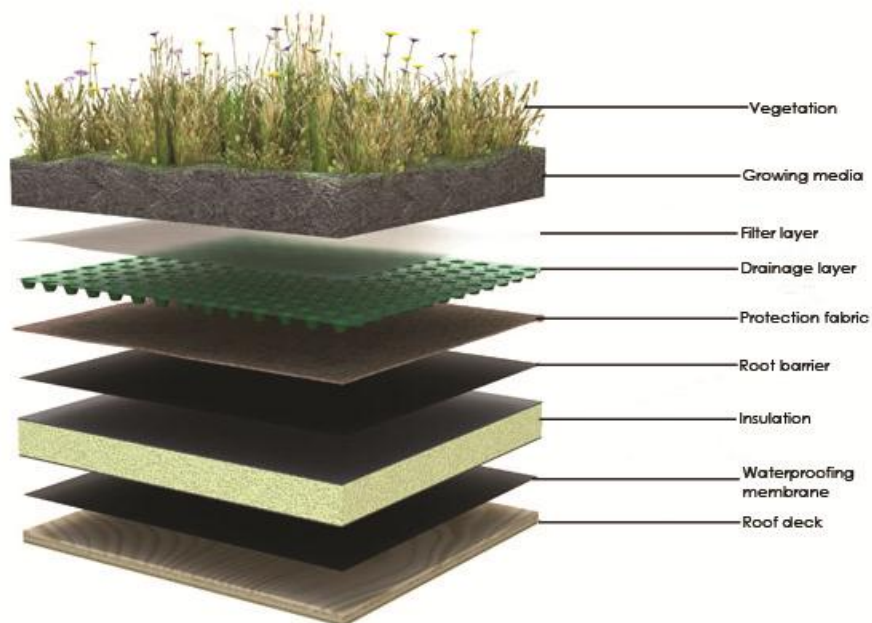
Schematic of the green roof structure (Soco construction 2013.)
